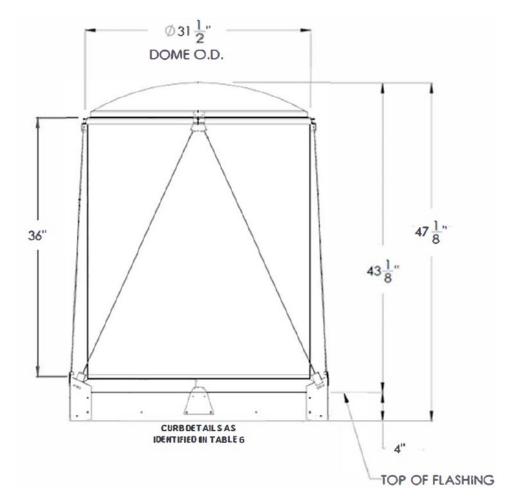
M74 Cylindrical Light Collector Assembly Dimensions
